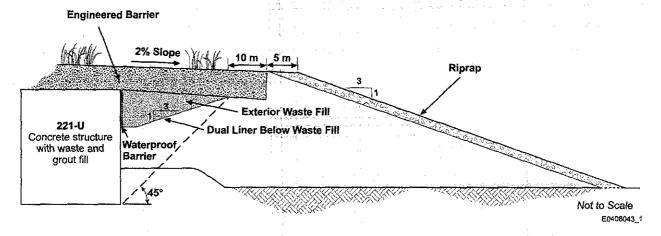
Alternatives 3 and 4 - Cross Section of the 221-U Facility Interior Waste Fill Plan.
